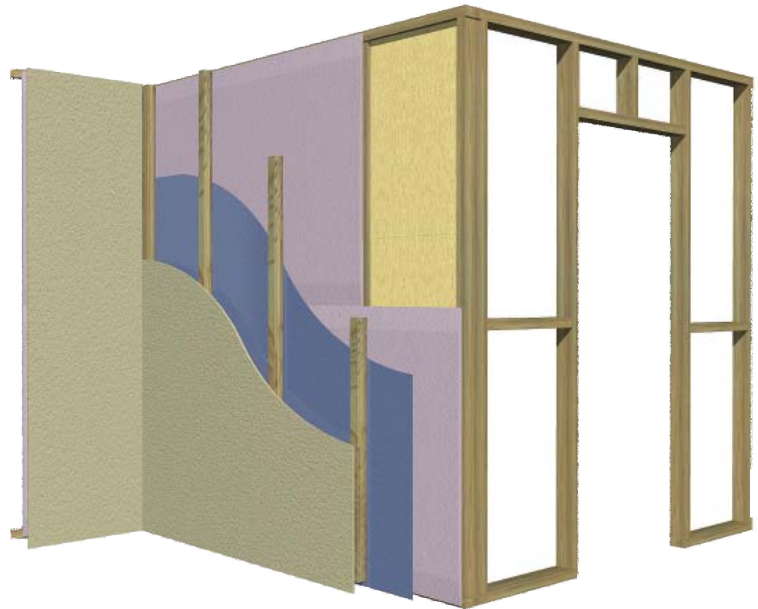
Fire Rated External Wall Control Joint Shaft Wall System
